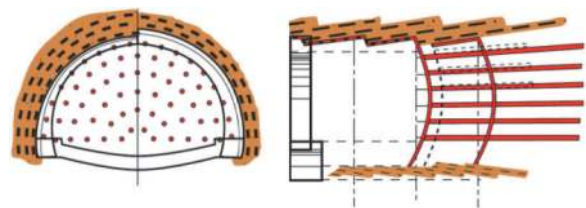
Reinforcements sketch made by jet grouting sub-horizontal columns.
